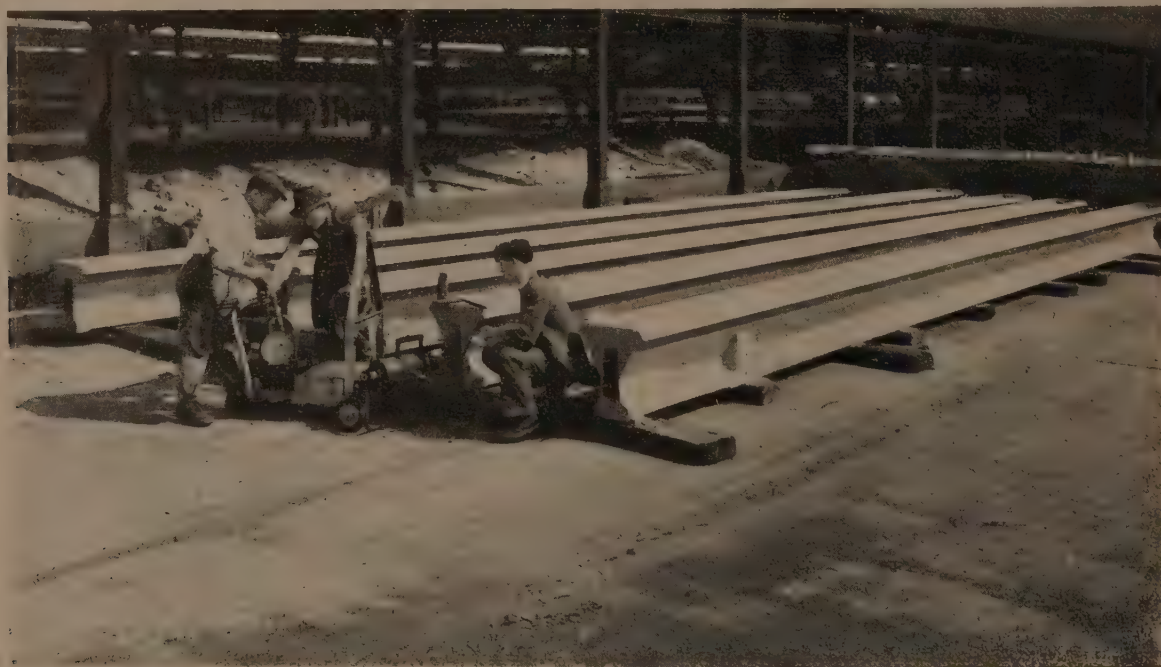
Stressing of roof valley beams for B.C.U.R.A. building at Leatherhead
